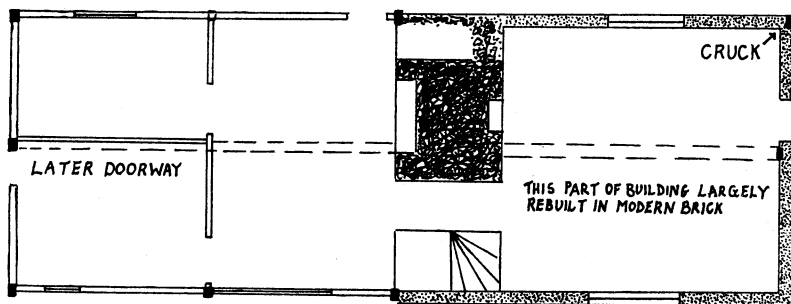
CHURCH FARM HOUSE - SKETCH-PLAN ABOUT TWO-THIRDS SCALE OF OTHER DRAWINGS
